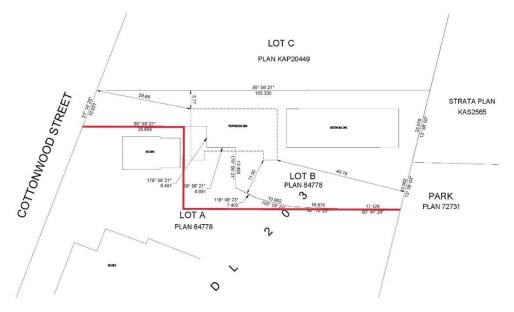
Tentative new lot line between 7396 Cottonwood St. and 7390 Cottonwood St.
